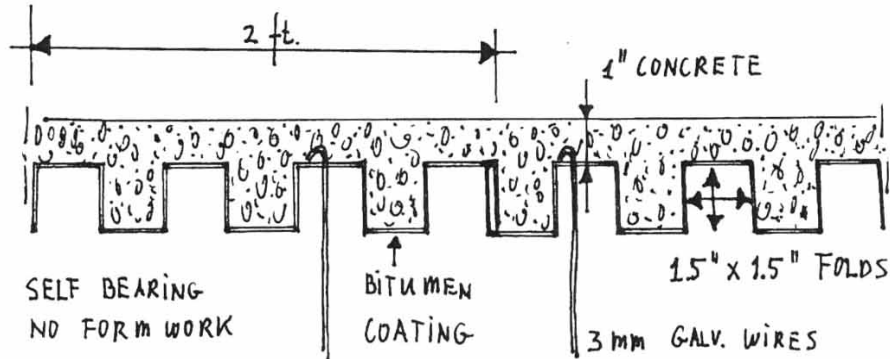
FOLDED METAL FLOOR OF 18-GAUGE (1.2MM) SHEET STEEL WITH AN 8 FT. SPAN
